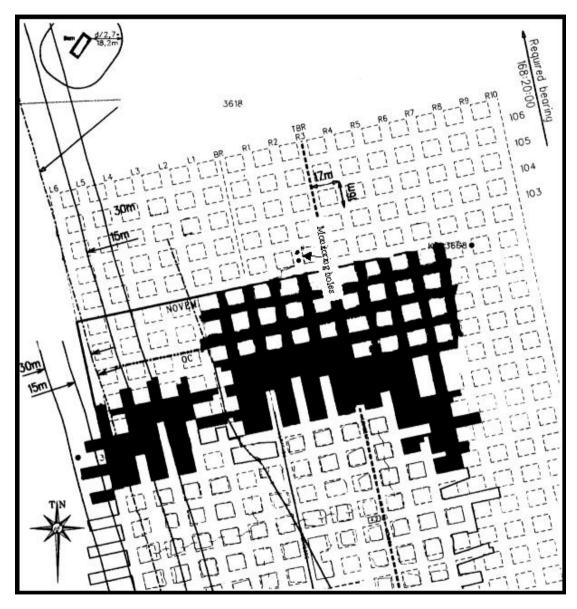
Section plan Colliery 'C' Site 1 (not scaled)
